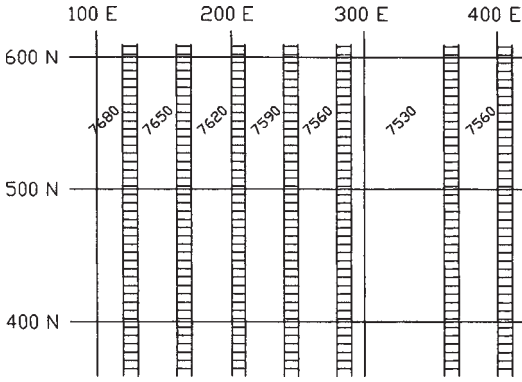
Plan view with the bench faces shaded and the flat segment elevations labelled.
